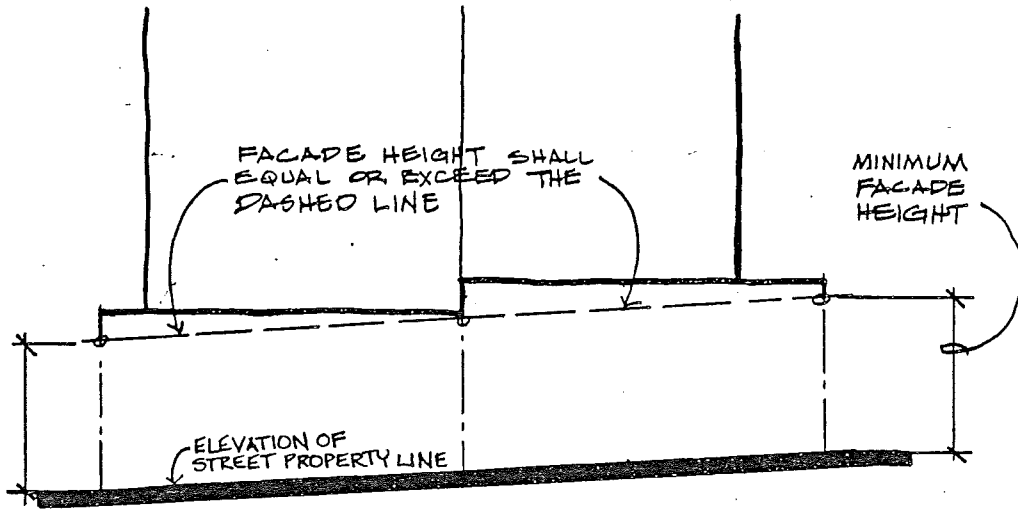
A MINIMUM FACADE HEIGHT
